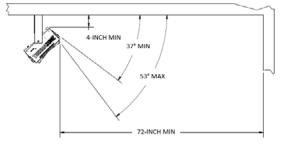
CEILING MOUNTING ANGLED TOWARDS VERTICAL SURFACE
